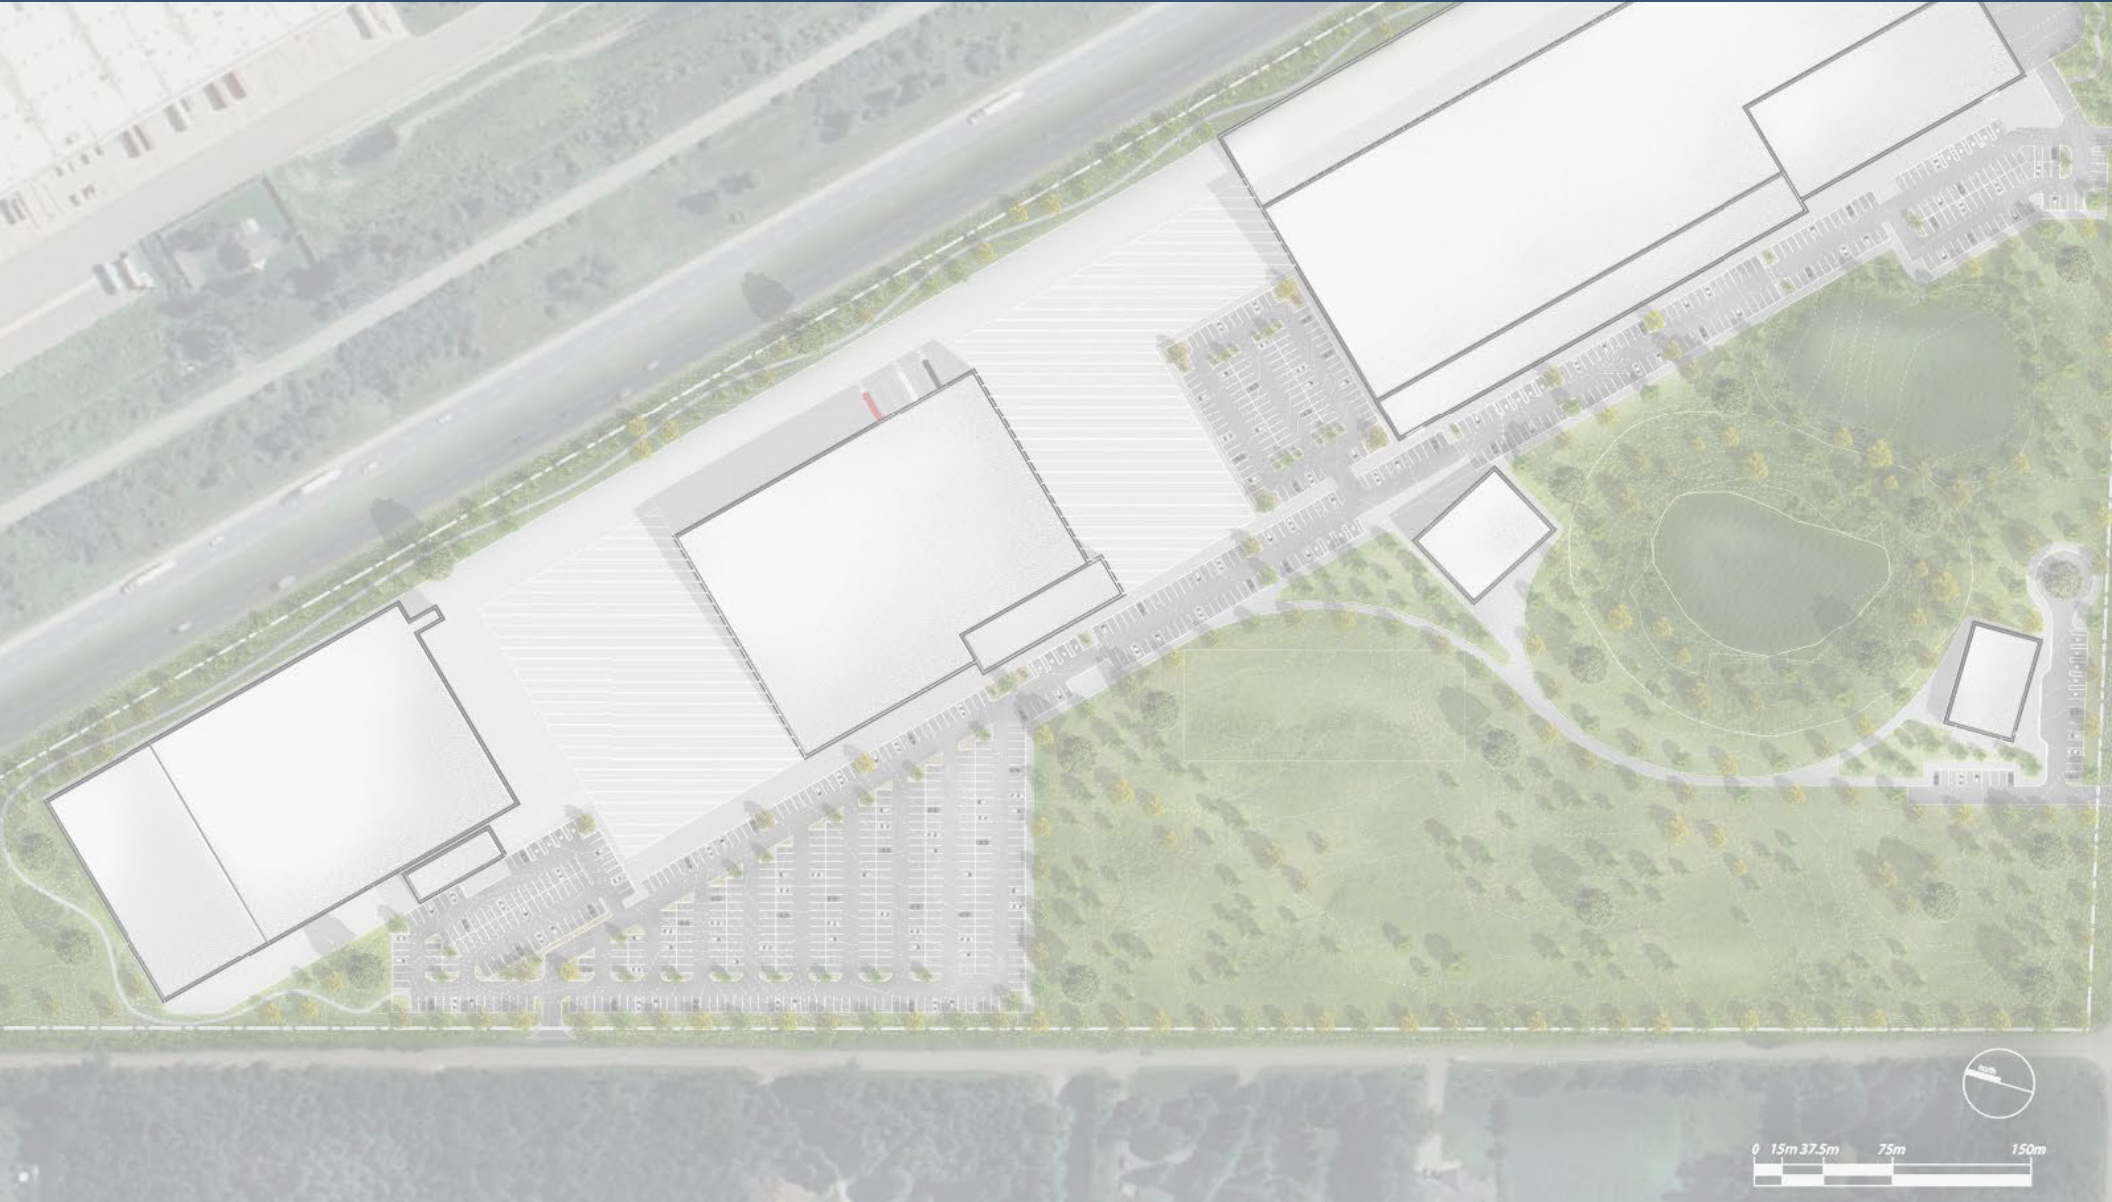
The Site at 4631 Sideroad 20 North, Puslinch
